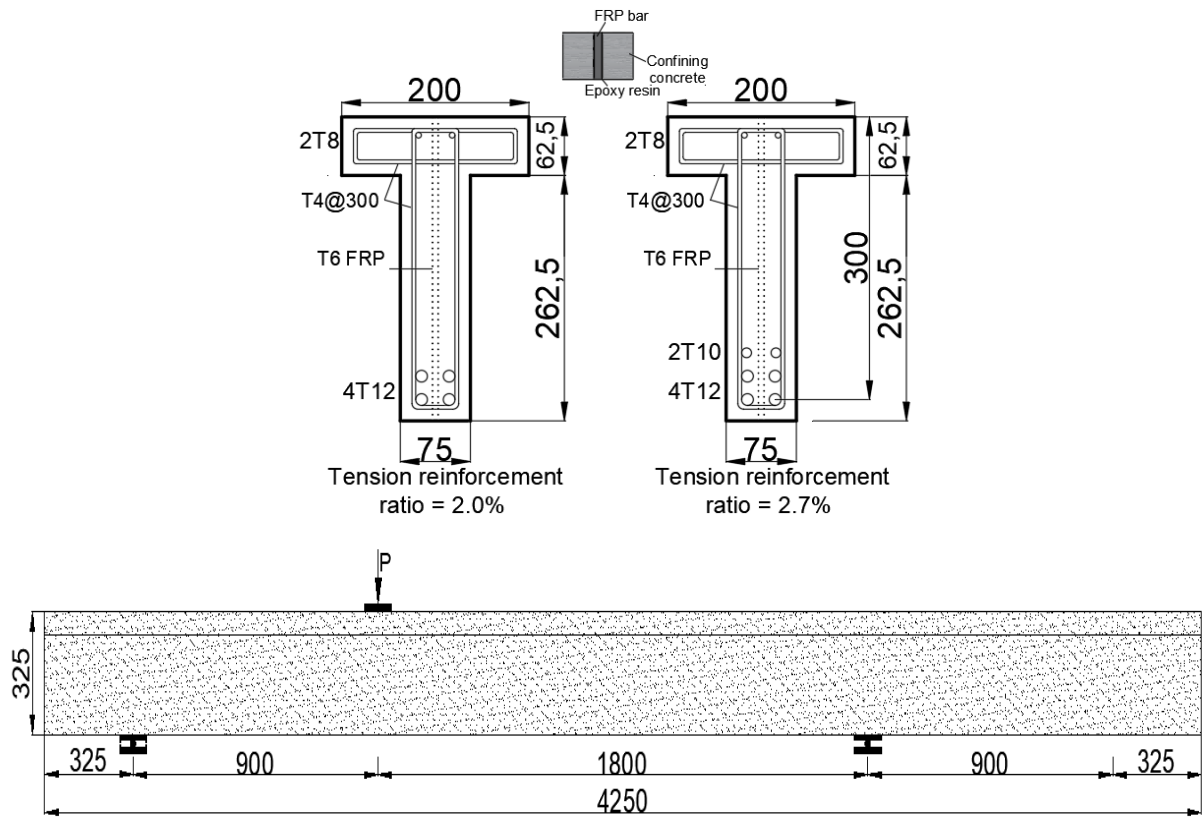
Cross-sections and elevation of tested beams (dimensions in millimetres)
